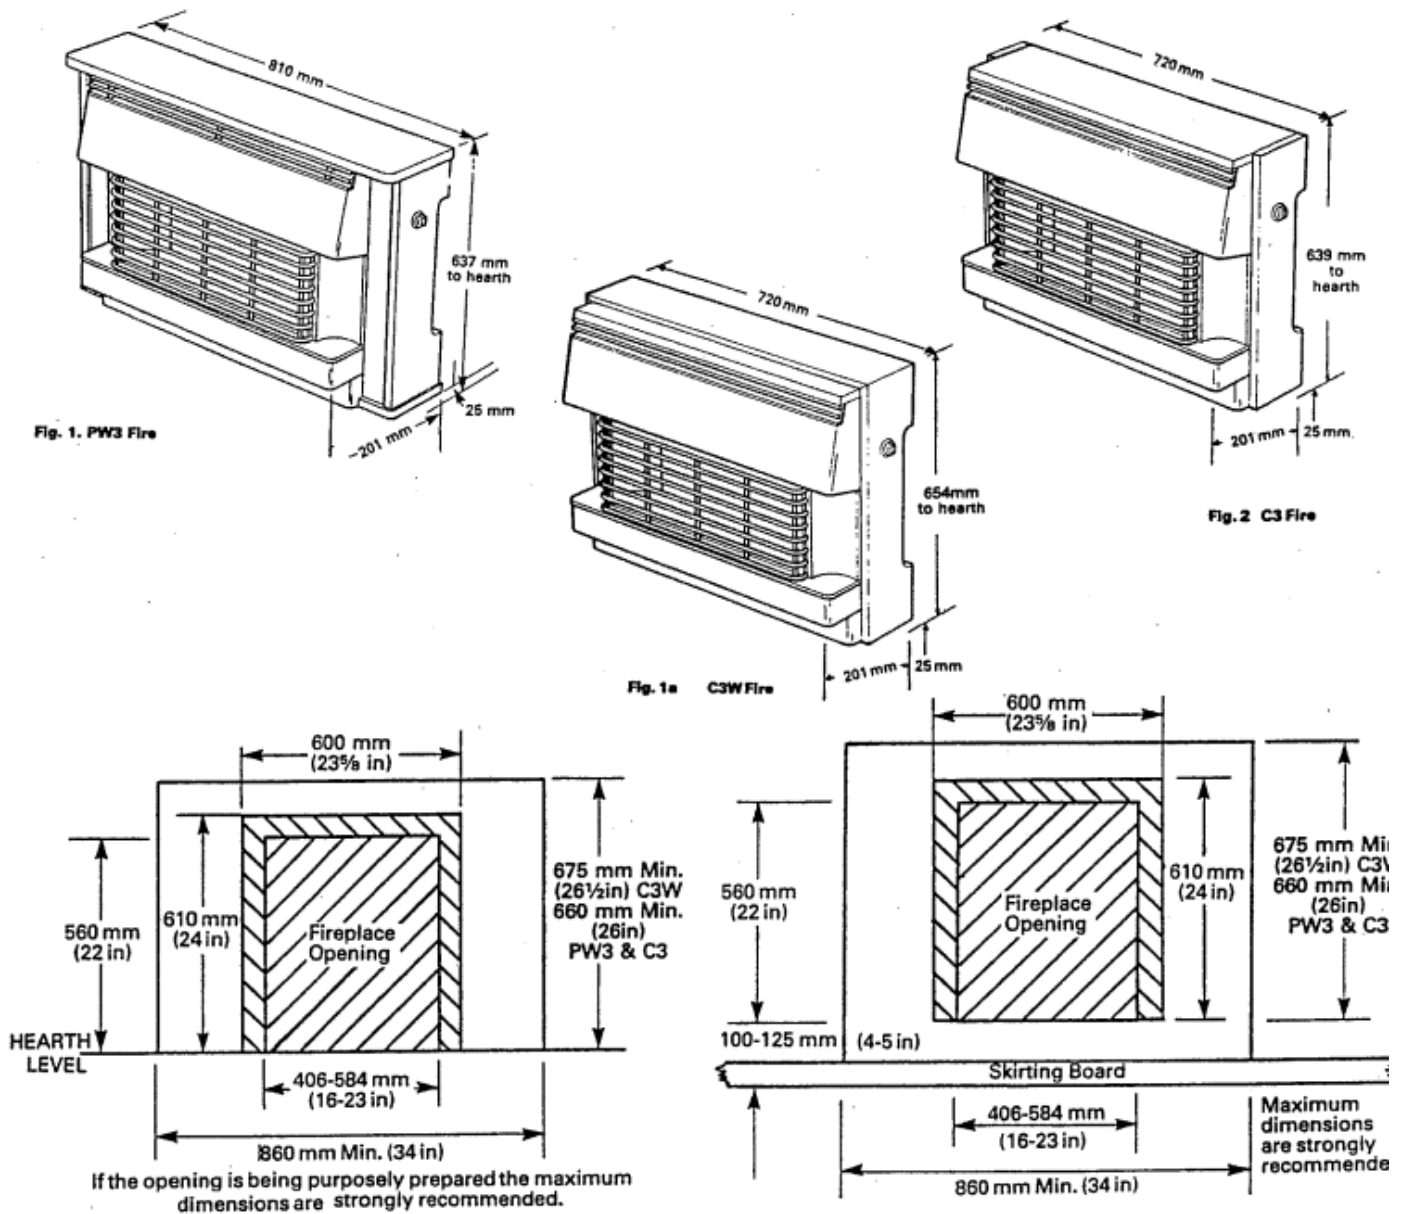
,2, & Fig. 3. Fireplace Opening & Fig. 4. Wall Fixing
